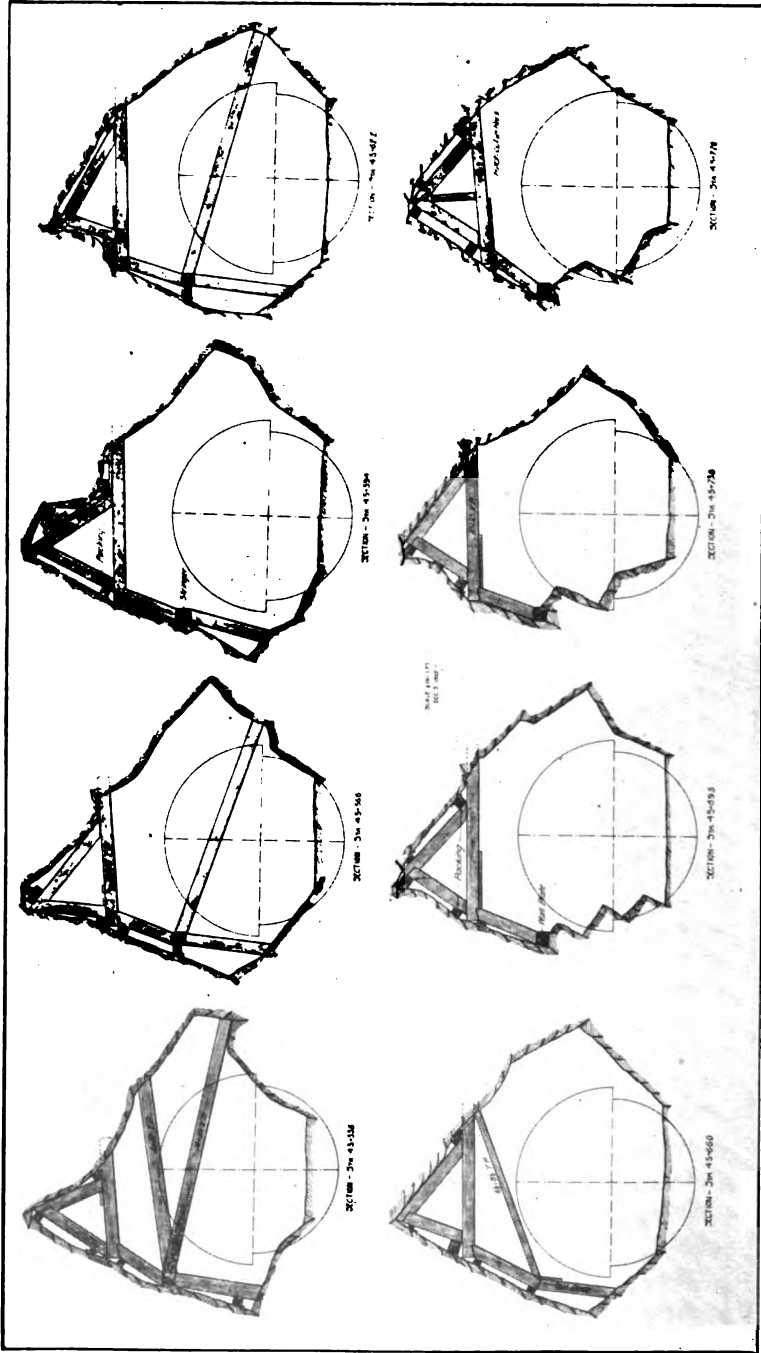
TORREDALE CONDUIT—TIMBER SETS, NORTH HEADING, SHAFT NO. 8.
